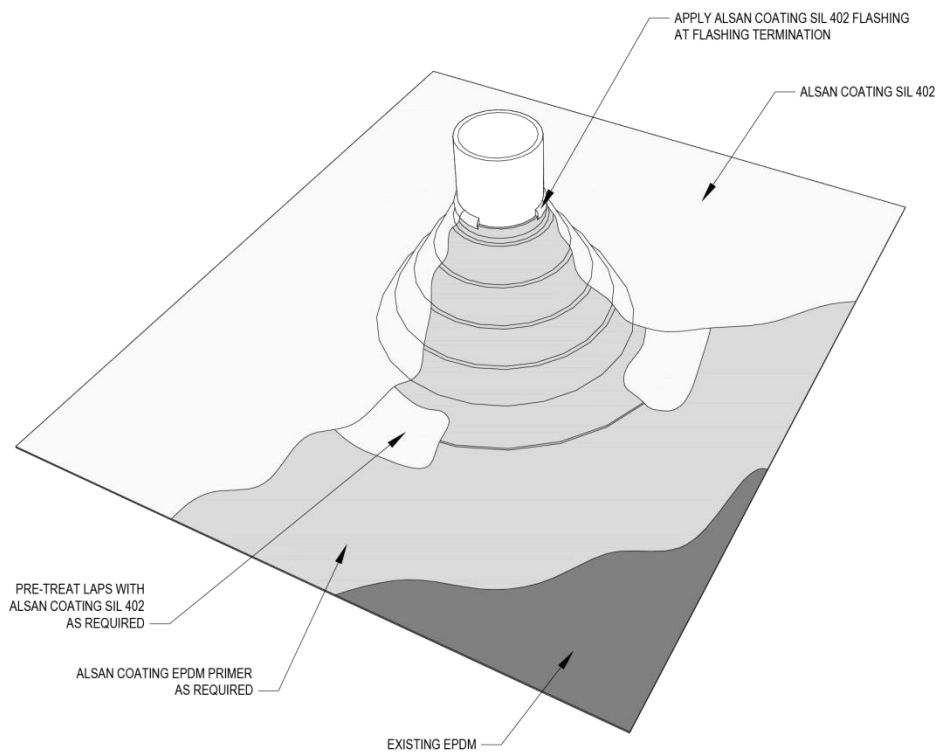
Silicone Roof Coating Over EPDM, Penetration
